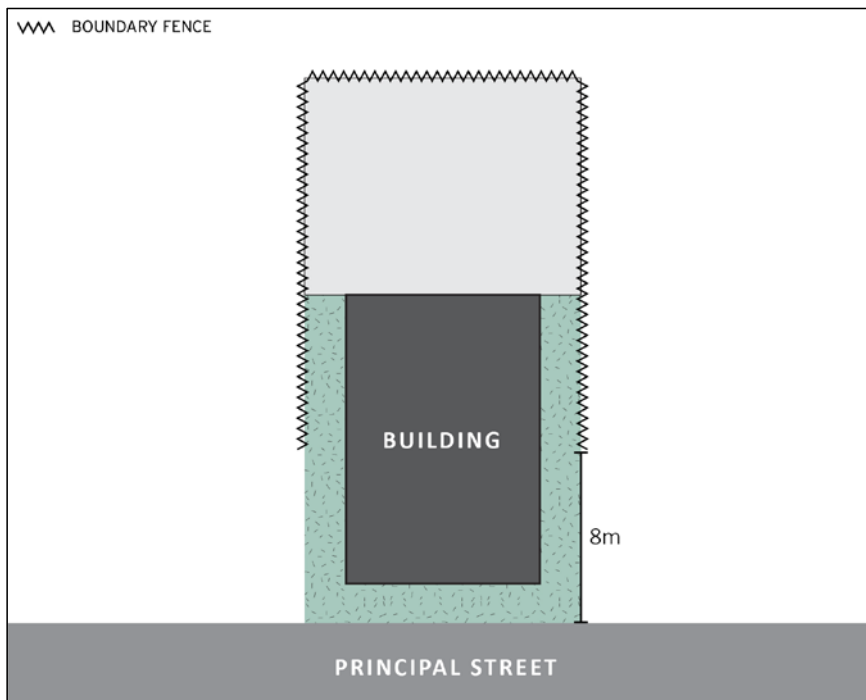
Construction of a new timber paling fence, which is visible from a street, is exempt if located in this area
